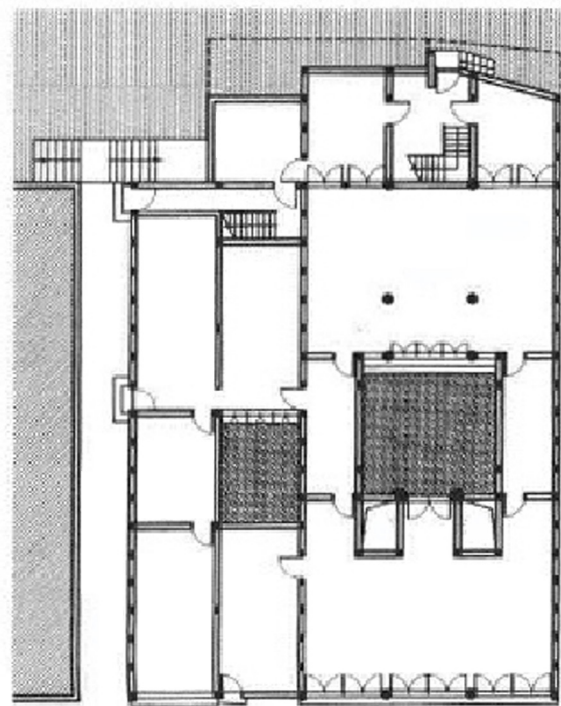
Typical plan of Suzhou waterfront dwelling
